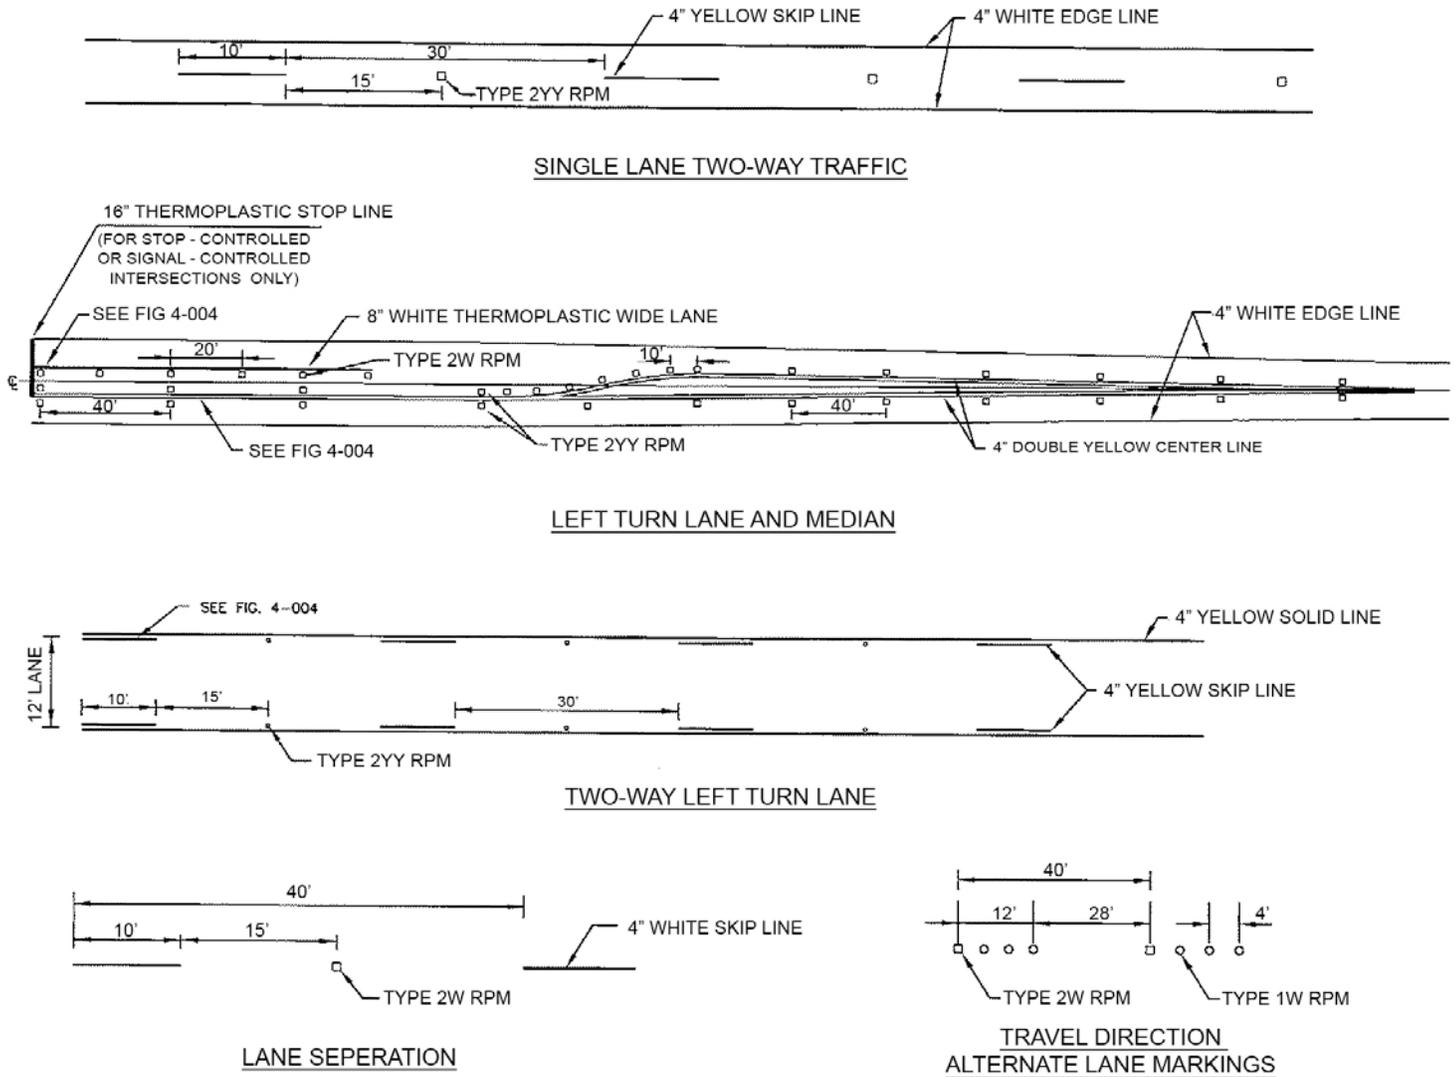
INTERSECTION APPROACH STRIPING
